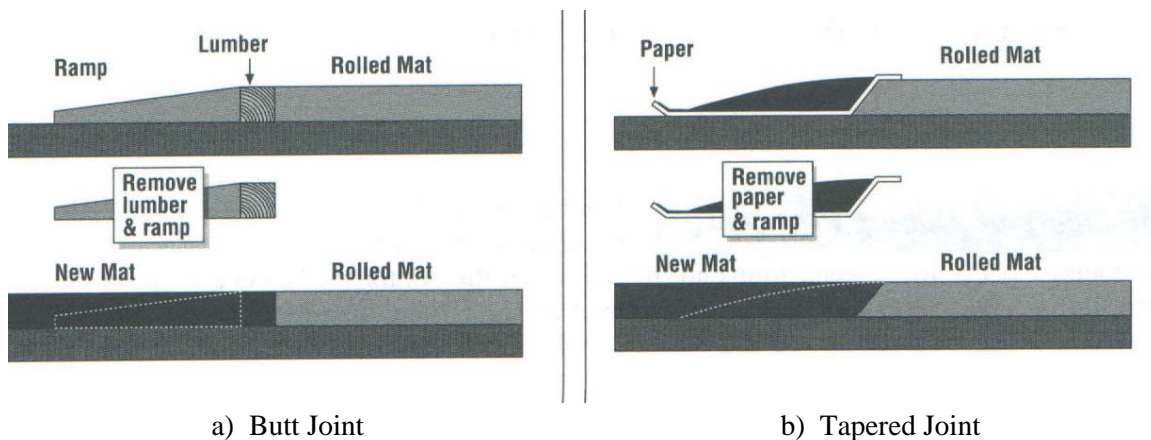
Transverse Joint Formation (Asphalt Institute, 1998)
